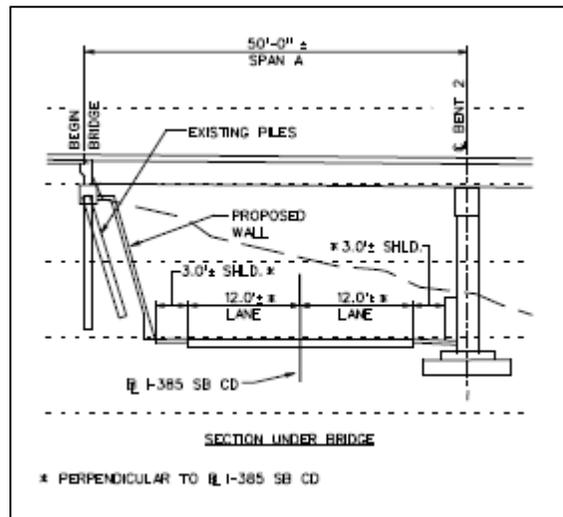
Minimum Section for I-385 SB CD under Woodruff Rd.
